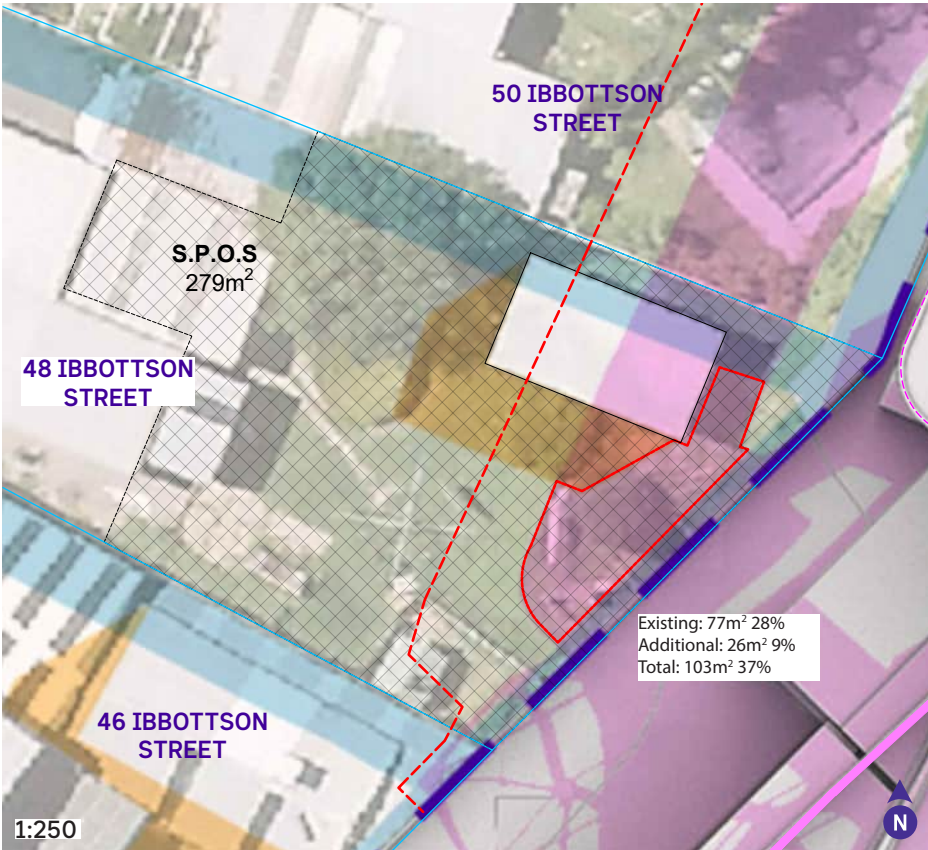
Detailed Analysis: 48 Ibbottson Street - 22nd September 10:00am (AEST)
